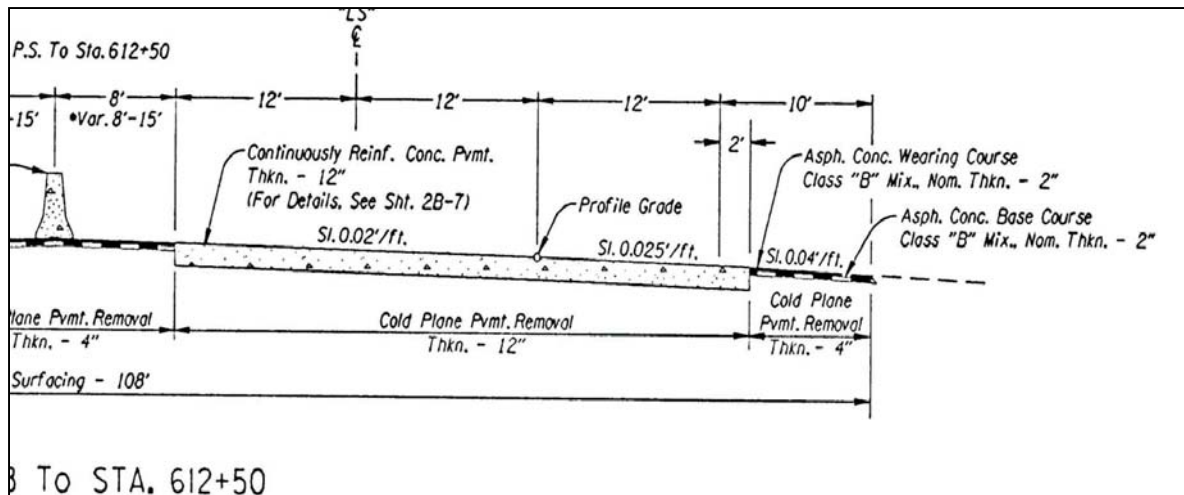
Example of Plan Section Provided by ODOT. (Courtesy of John Coplantz).
